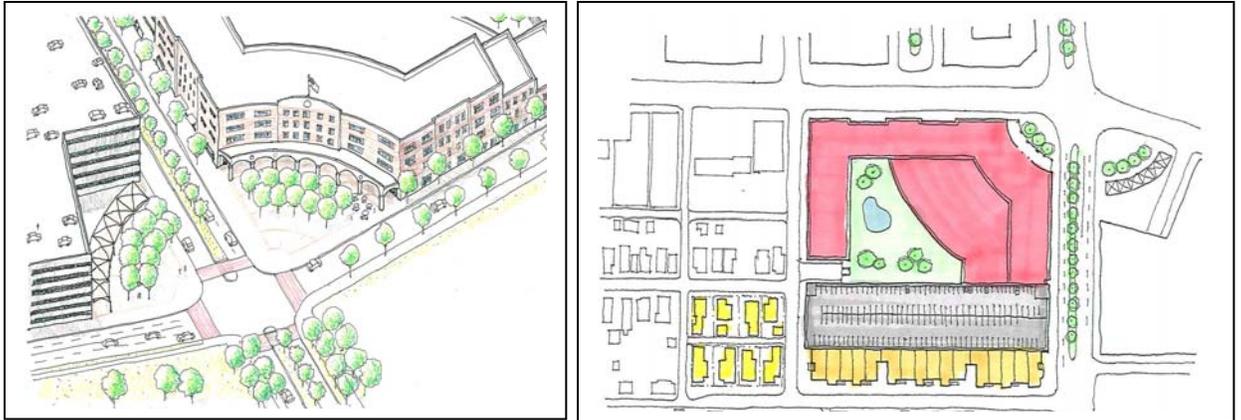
Concept perspective and plan for Parsons and Livingston Avenue intersection
